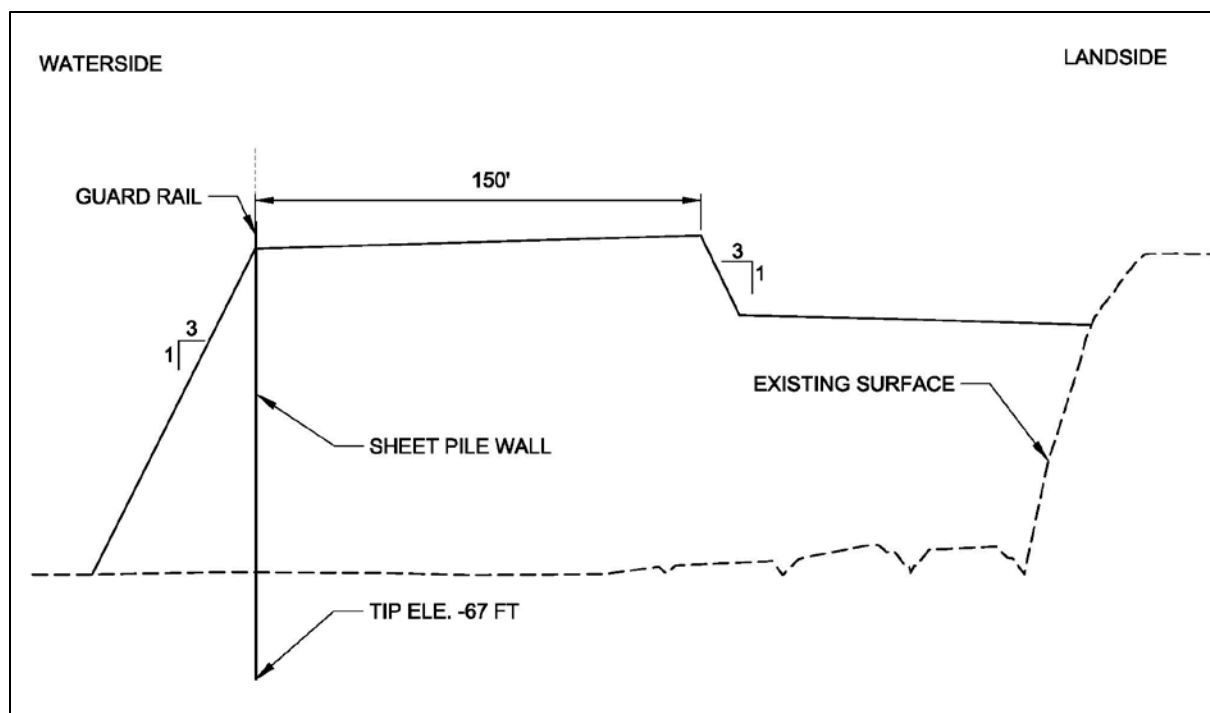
Sheet Pile Wall with Embankment Fill.
